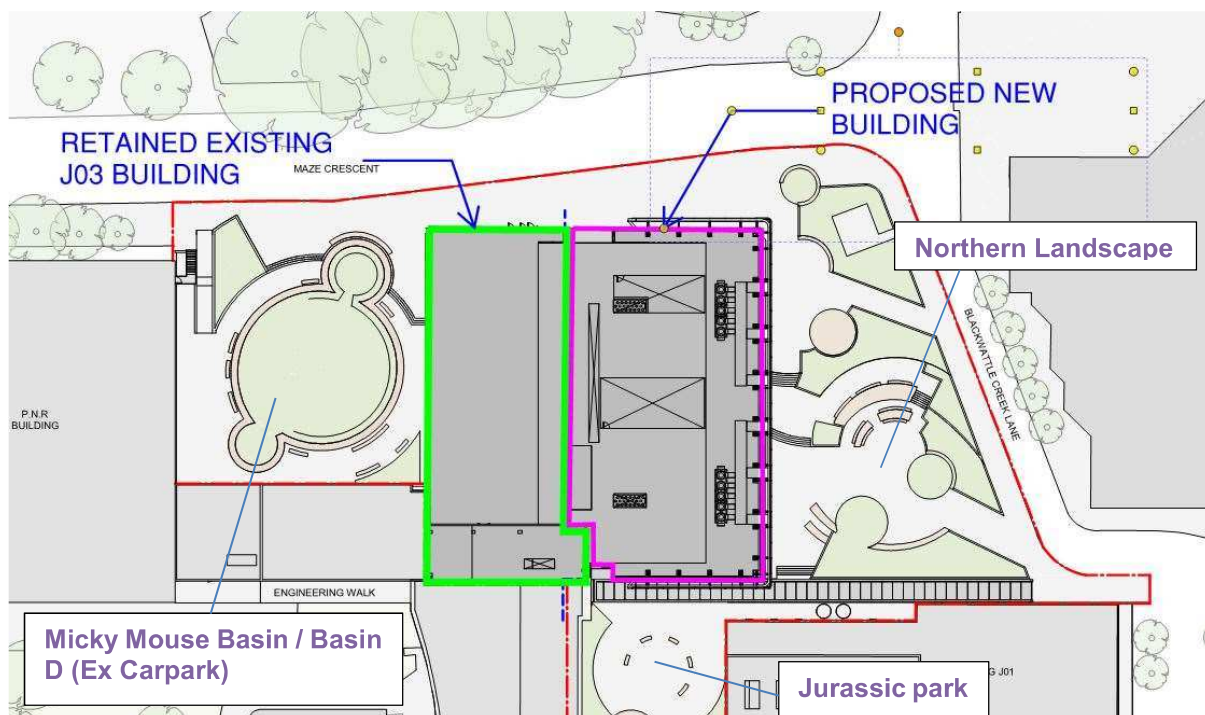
Proposed Redevelopment of Existing Electrical Engineering Building
